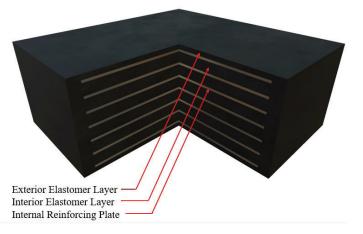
Cut-Away View of a Reinforced Elastomeric Bearing
